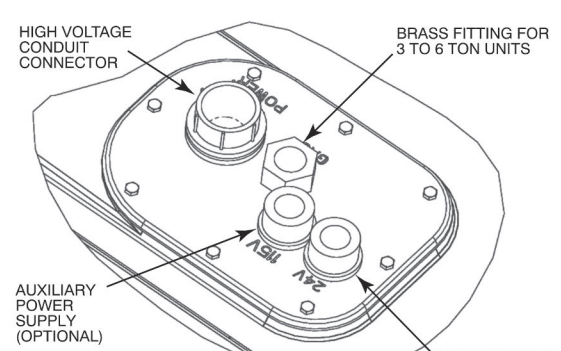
Thru-Base Gas Connection Fittings (Four Hole Cover Plate Shown)
